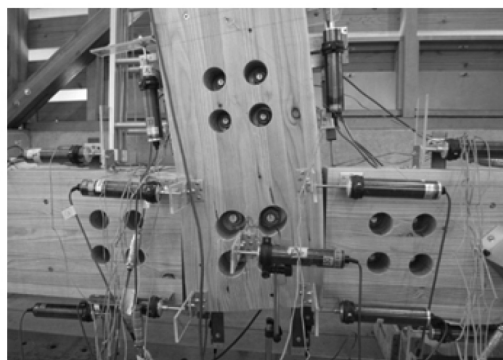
Shear cracks at pre-drilled hole periphery
